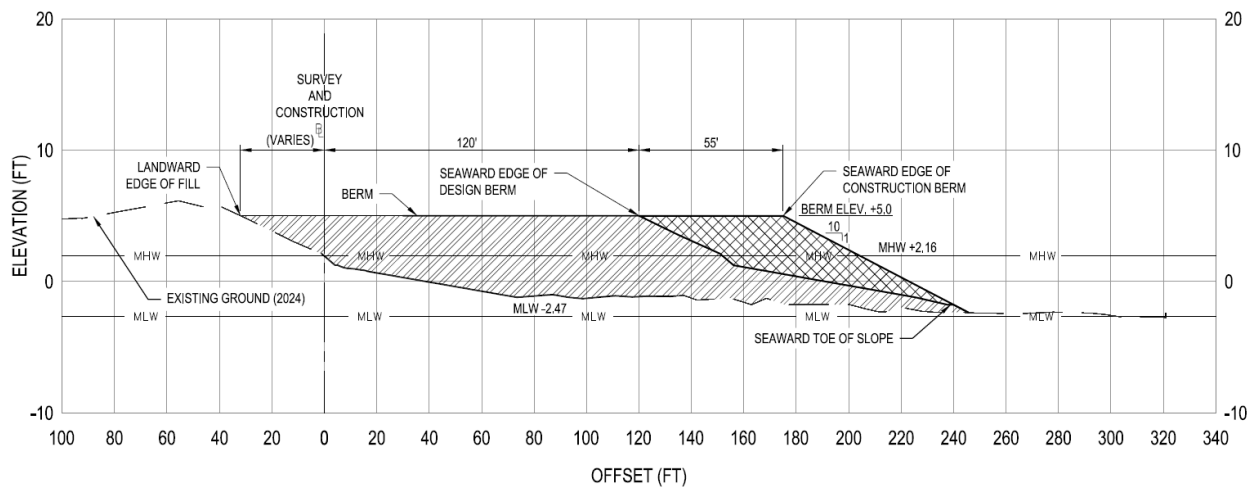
Alternative 1 – Beach Nourishment Typical Section
